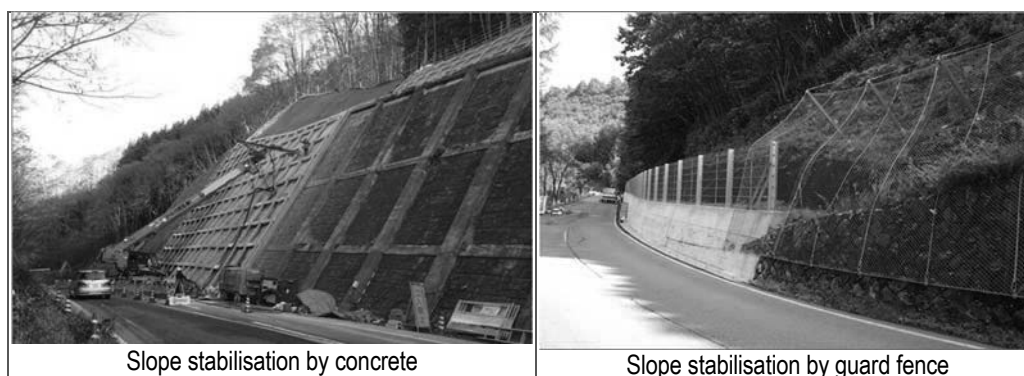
Examples of Slope Stabilisation Works in Japan
